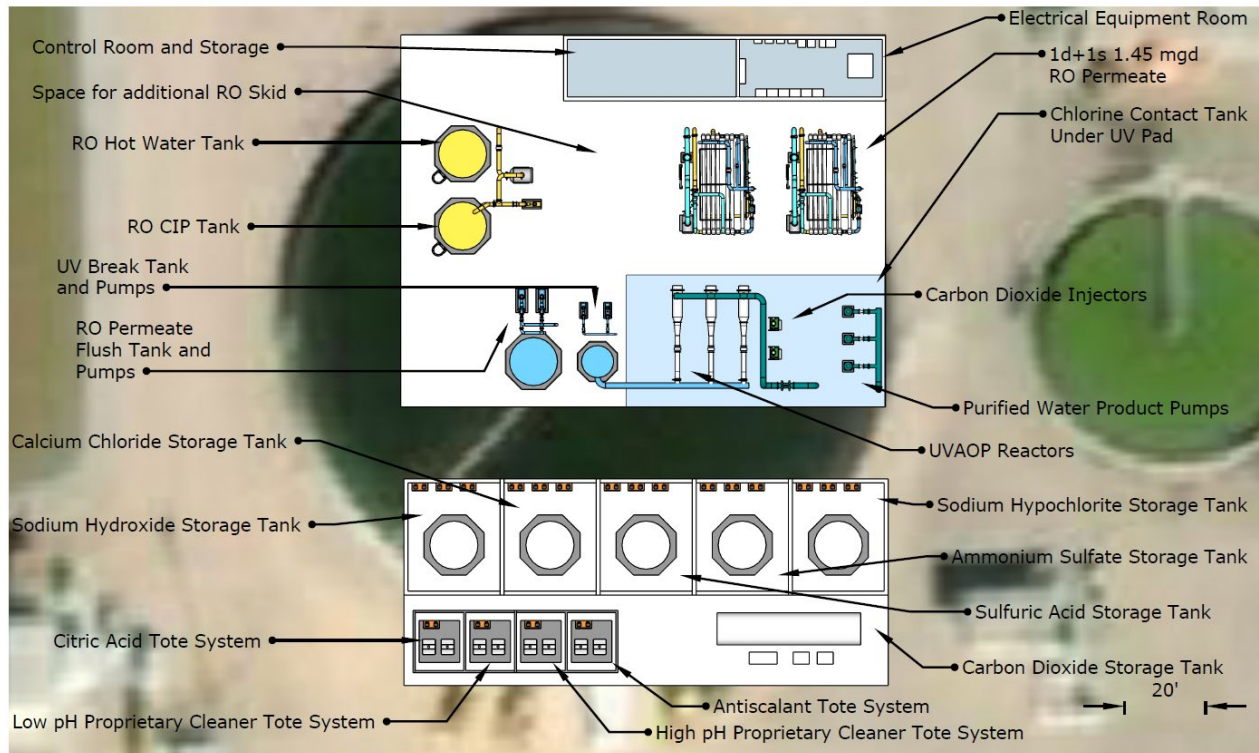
Full IPR Implementation Site Layout – new RO and UV systems (Plan View)
